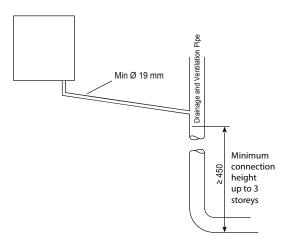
Connection of the Condensate Water Drainage Pipe to Internal Drainage and Ventilation Pine
